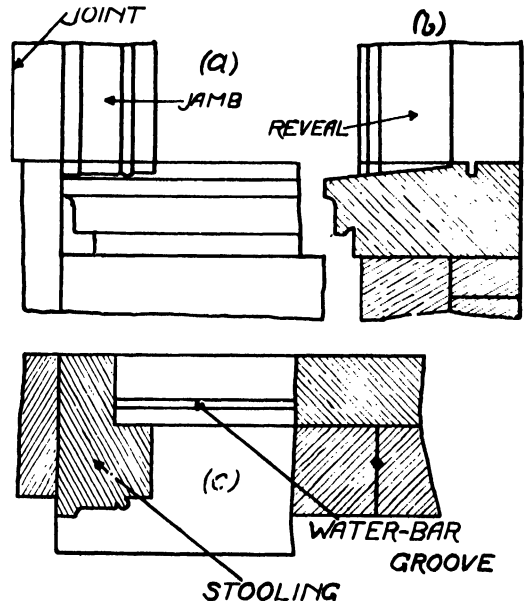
(a) ELEVATION, (b) SECTION, (c) PLAN
